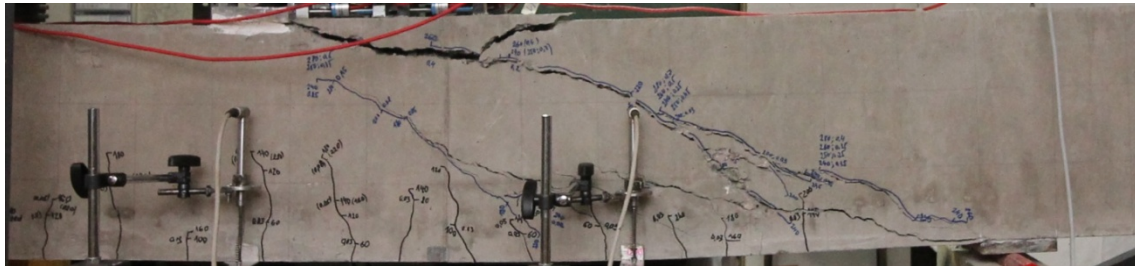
Crack pattern in the back side of the HVFAC-2 beam after failure
